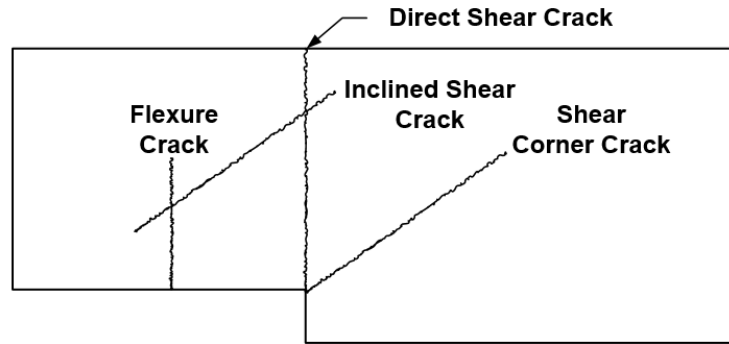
Crack Location for Dapped End Double Tee Beams
